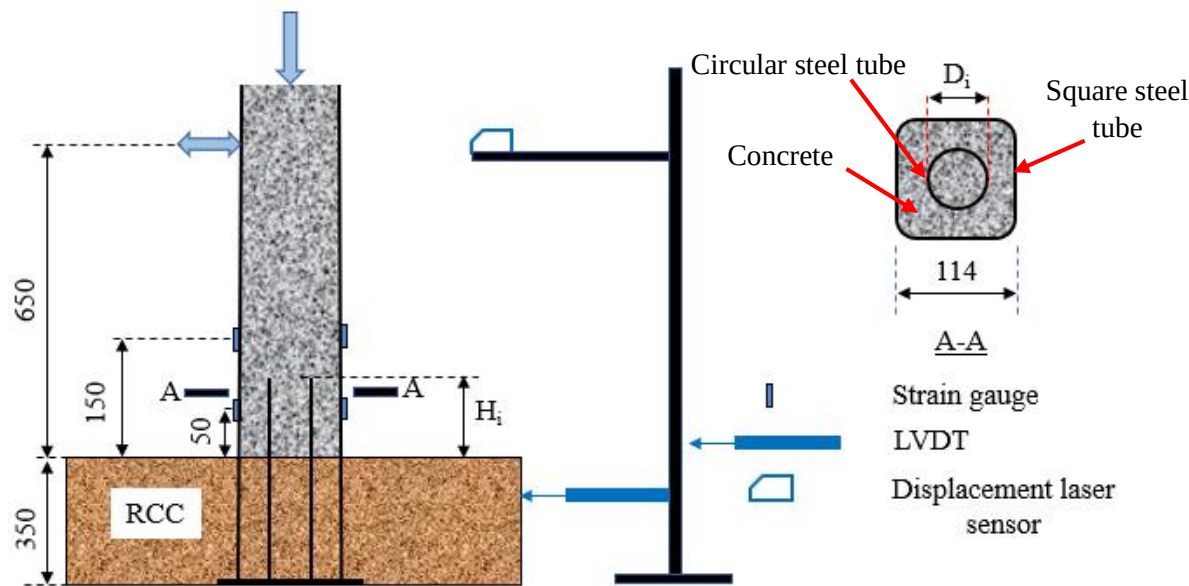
Configuration of typical specimen and instrumentation (unit: mm)
